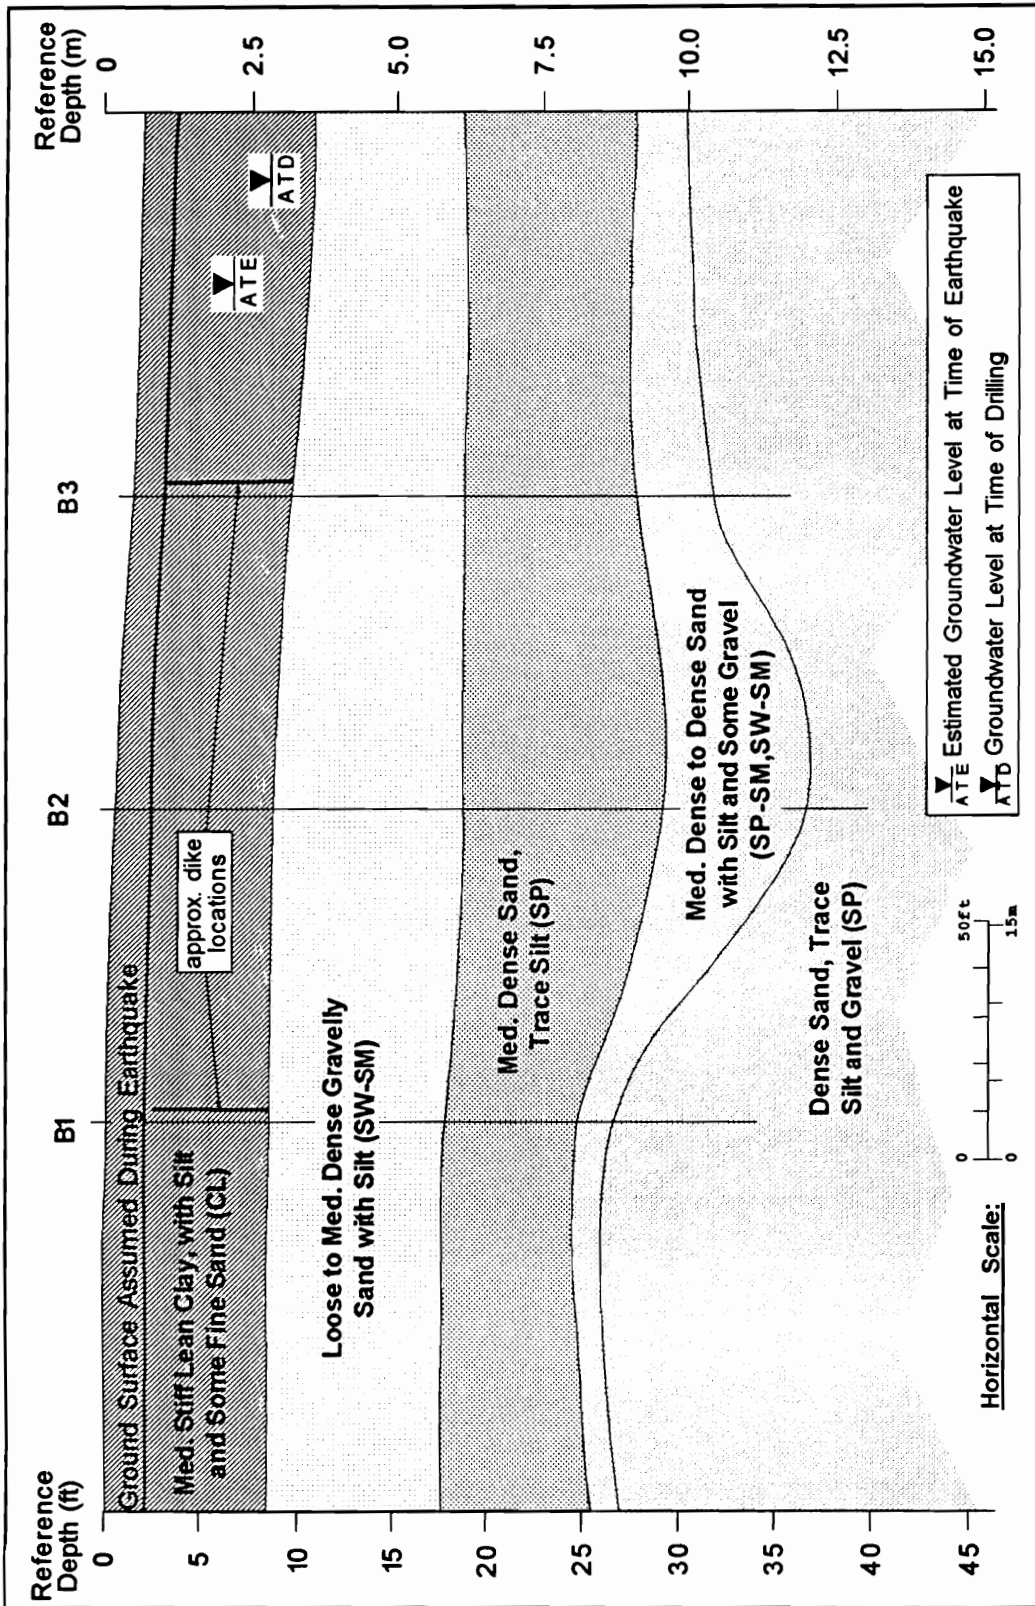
Near surface soil profile for site Seymour Sand Pit (SSP)
